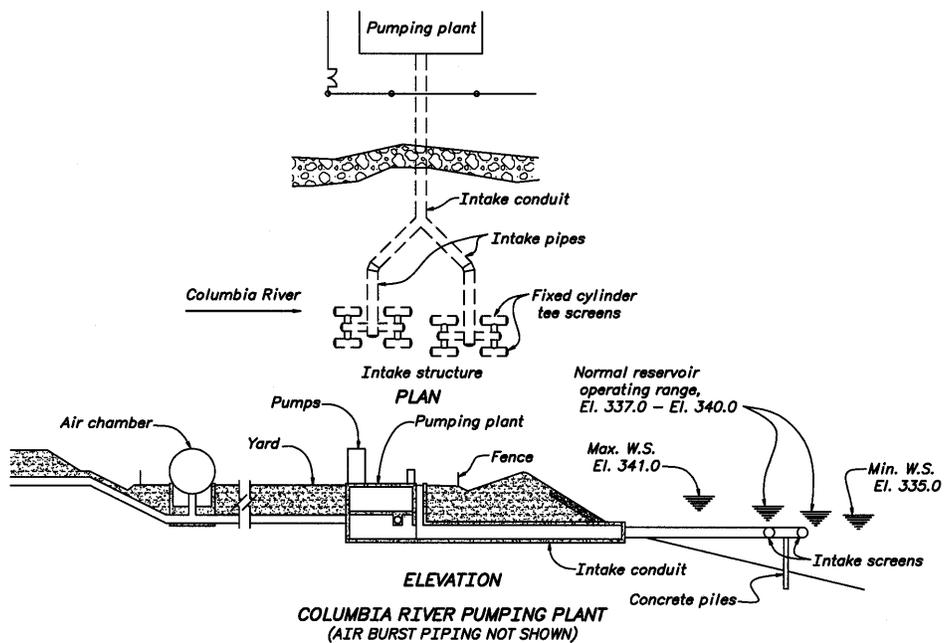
Plan and elevation of Columbia River Pumping Plant.
